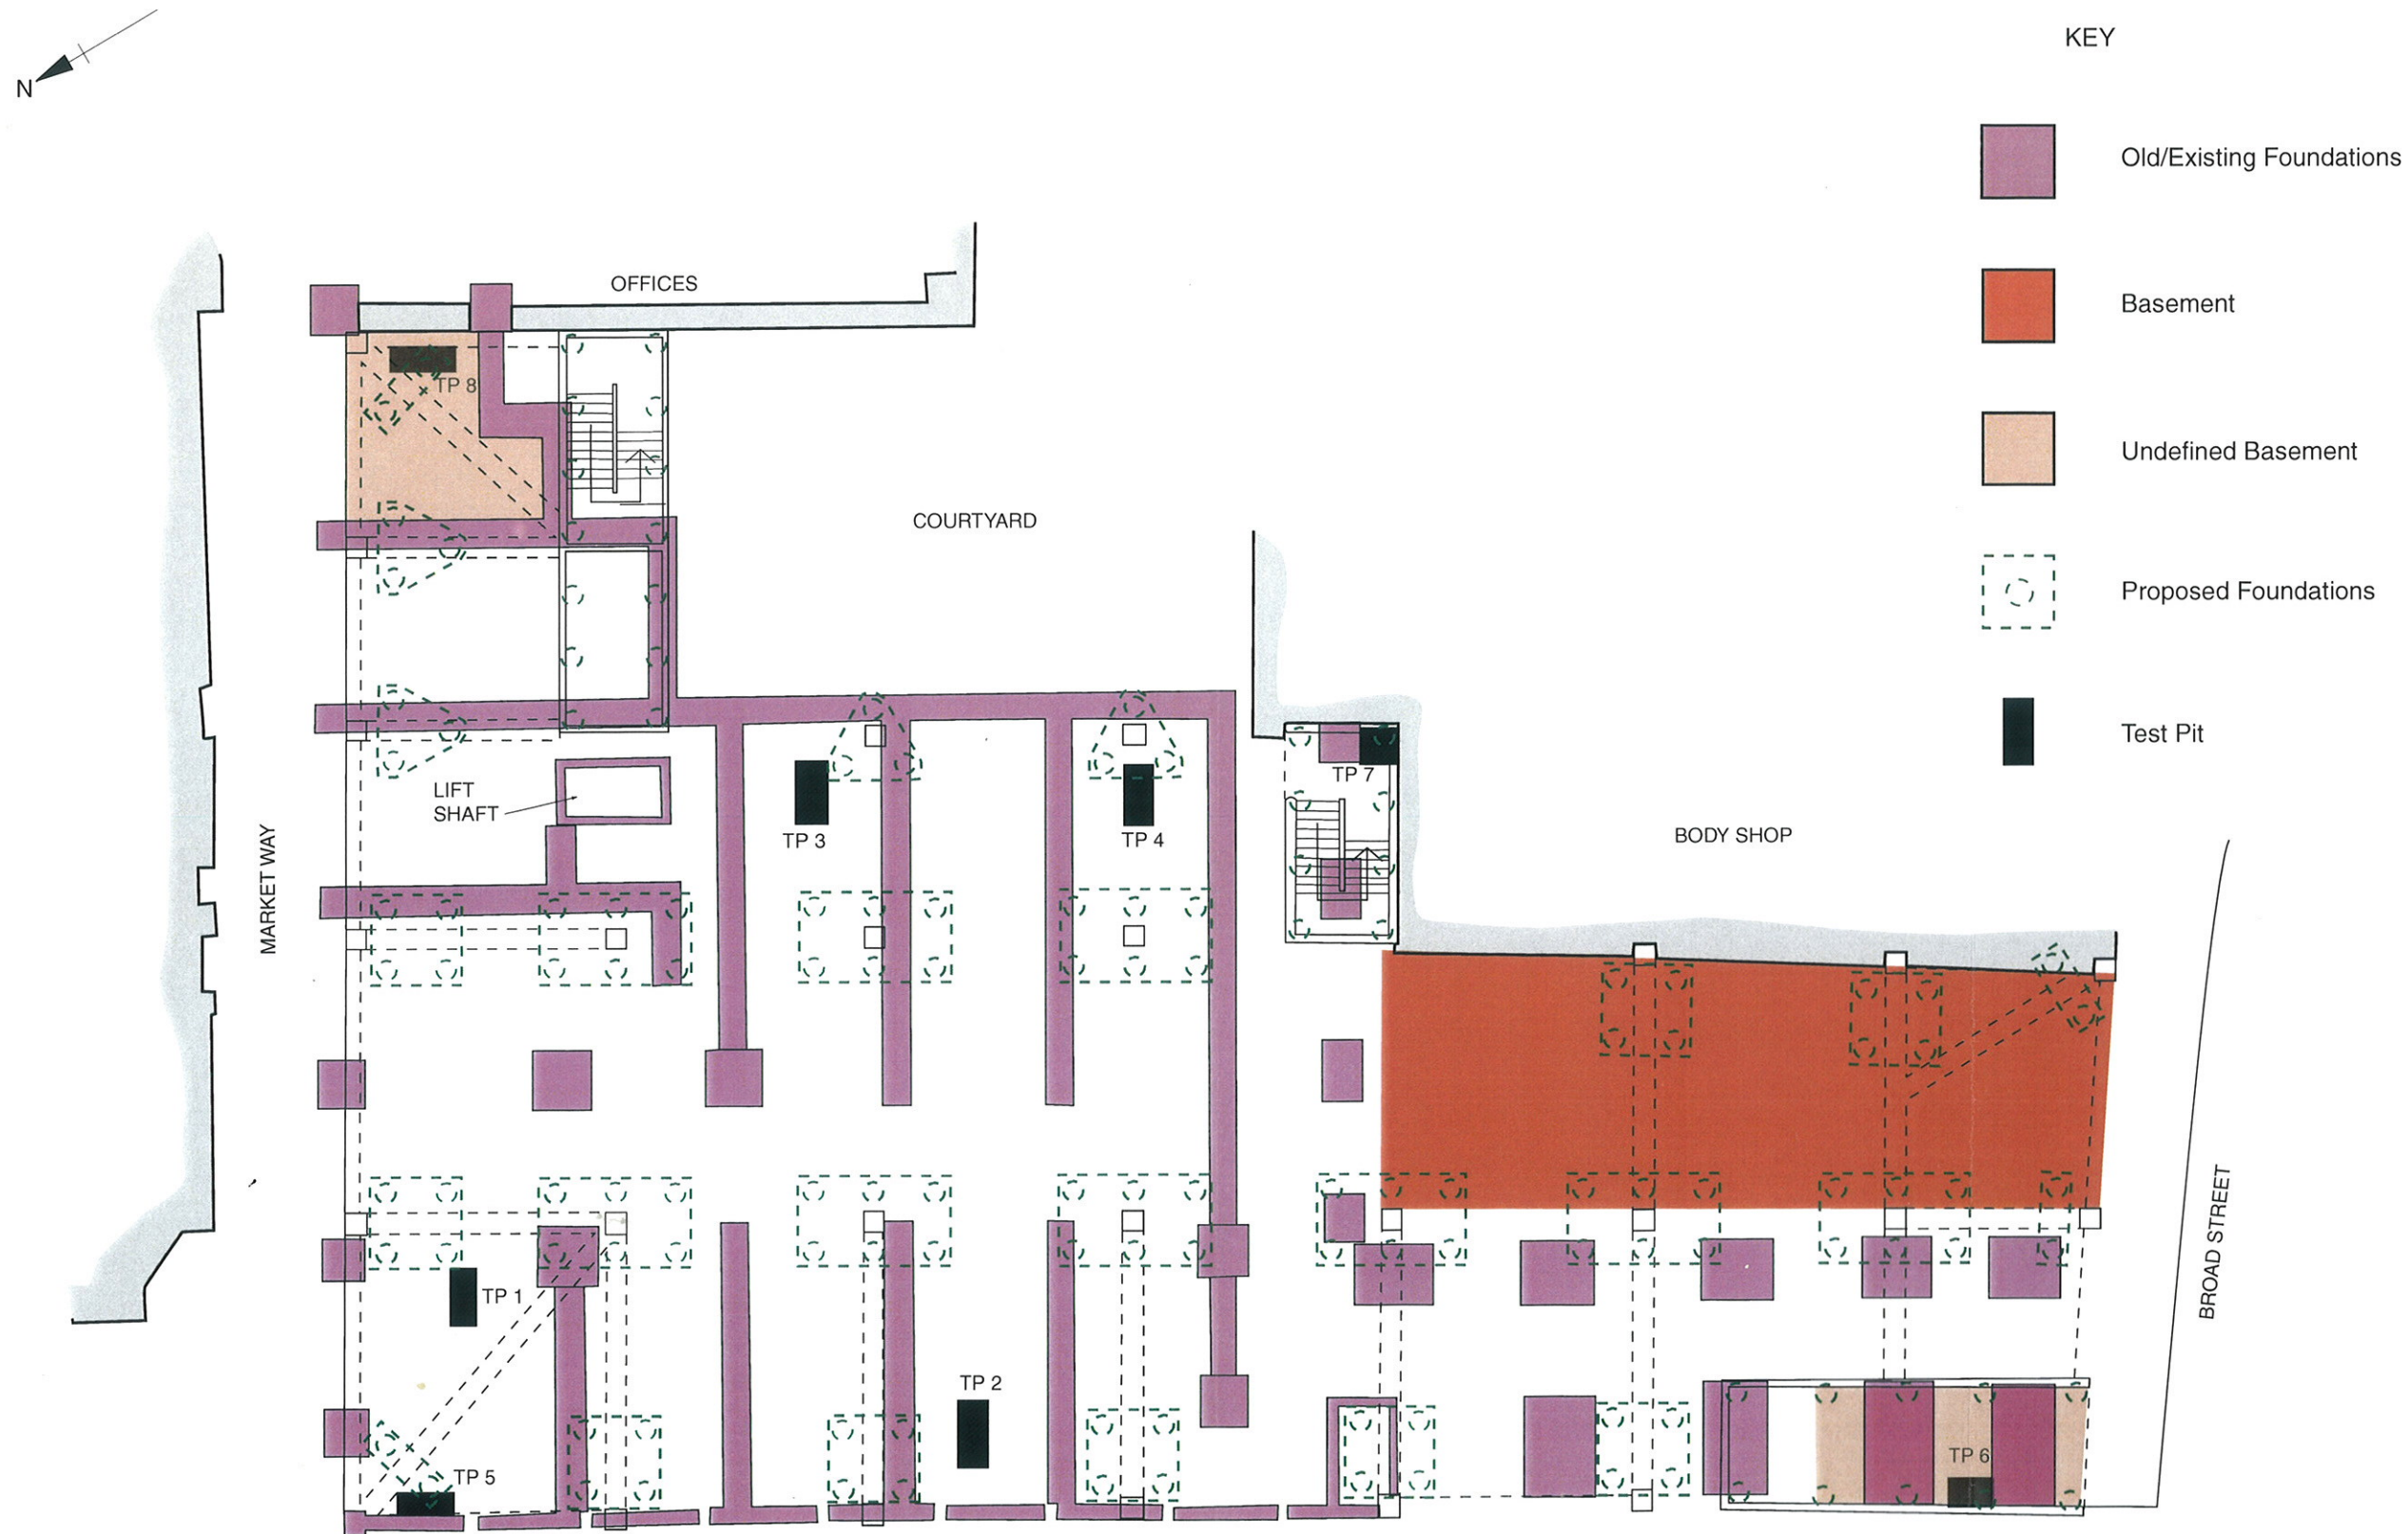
Old and Proposed Building Foundations and Test Pit Locations
